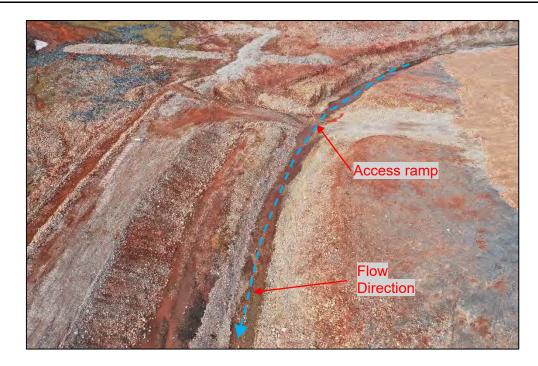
West Twin Dyke Spillway – Spillway access ramp, looking upstream from UAV.
